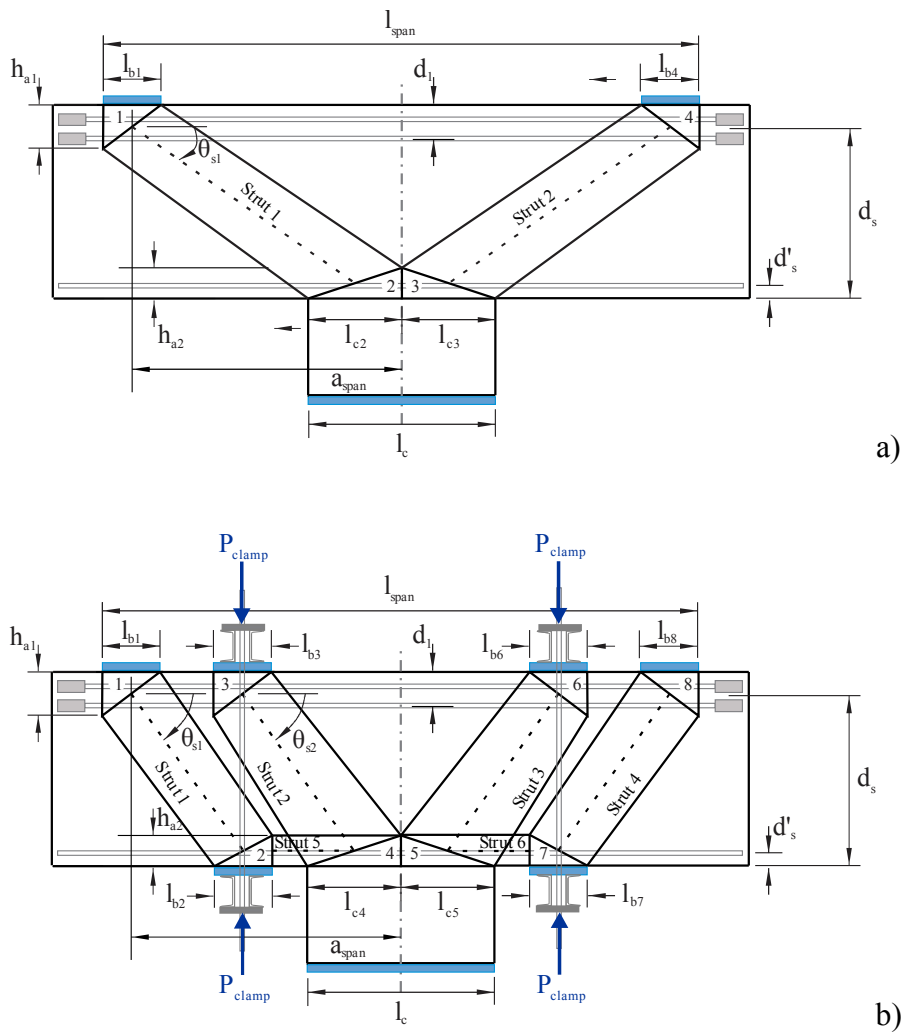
Strut-and-tie model of: a) original bridge pier cap; and b) strengthened bridge pier cap
